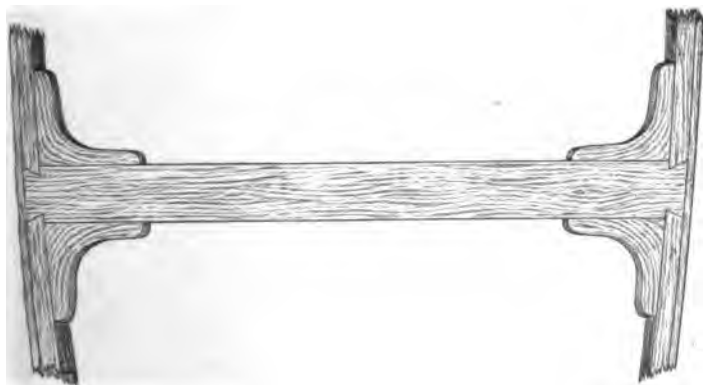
SURFACE AND SIDE VIEW OF GUN-BEAM WHEN FIXED, 1 in.=1 ft.
